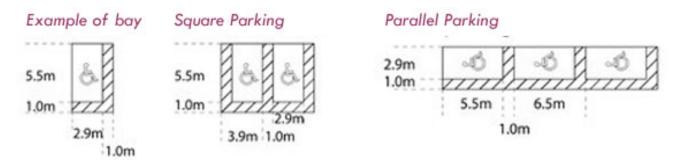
Disabled Parking Arrangements | NRDG, Section 3.5.11
